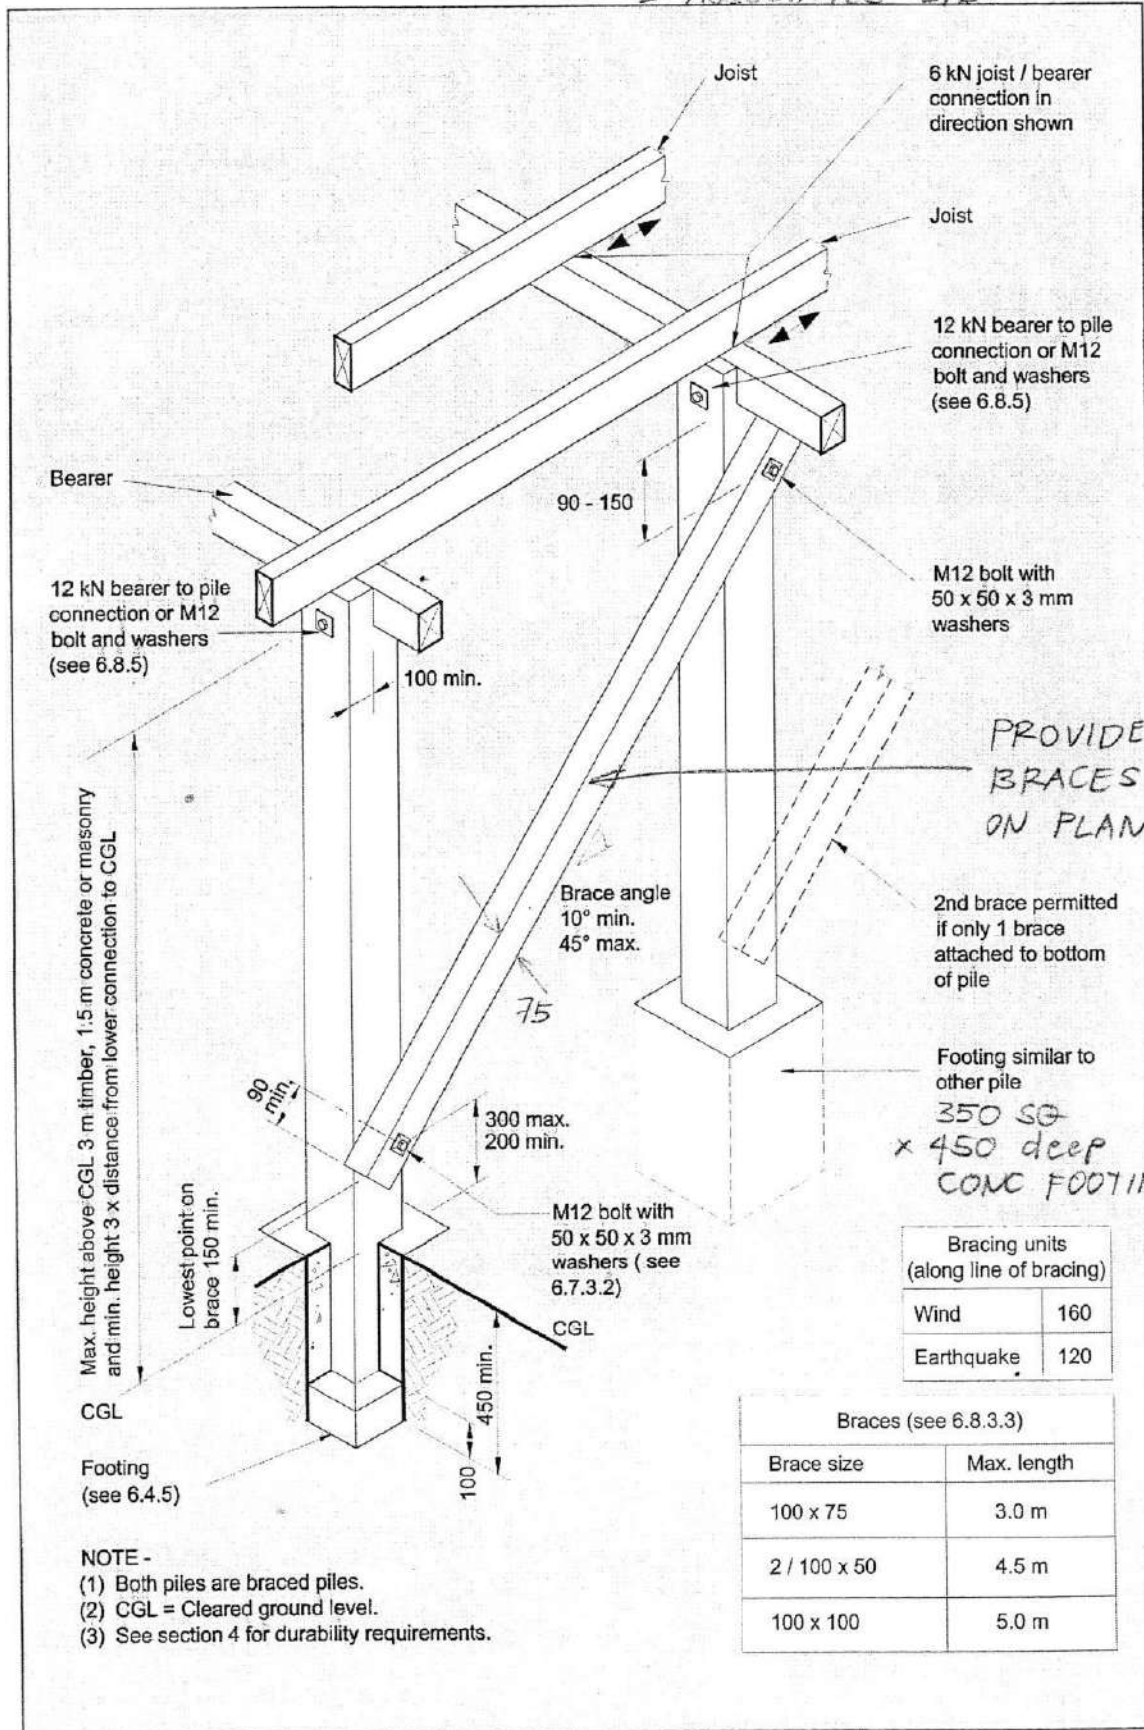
Braced pile system - Brace connected to pile (see 6.8)
